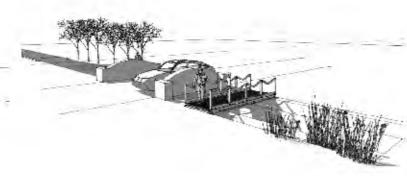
Culvert crossing and footbridge (Briel, 2015)
